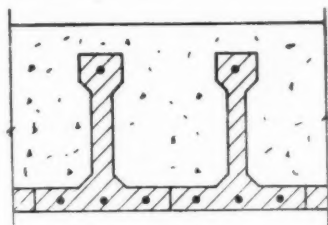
Composite prestressed concrete construction with prestressed inverted "T" sections and in situ concrete filling.
